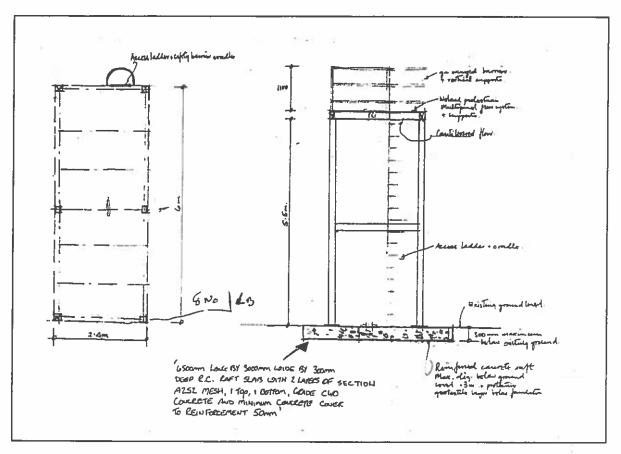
Engineers drawing of proposed Camera gantry at Carmarthan Football ground
